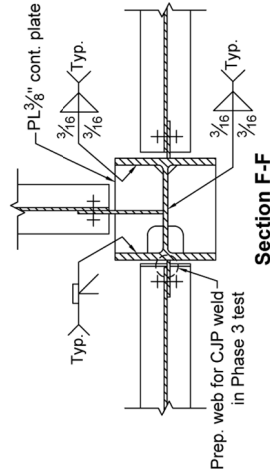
Phase 2 Test Building: Elevations (continued)
